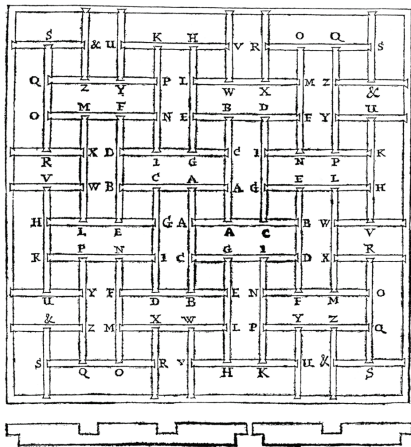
Sketches of the planar grillage developed by Wallis [10]. The reciprocal structure allows long distances to be covered using multiple short elements that support each other.
